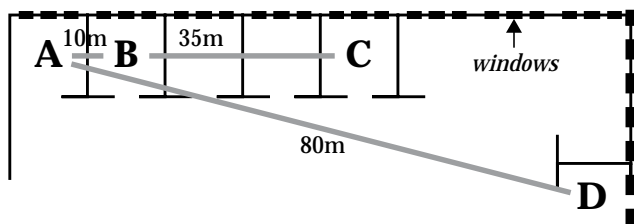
Floorplan of 550 Cory Hall (East Wall)
